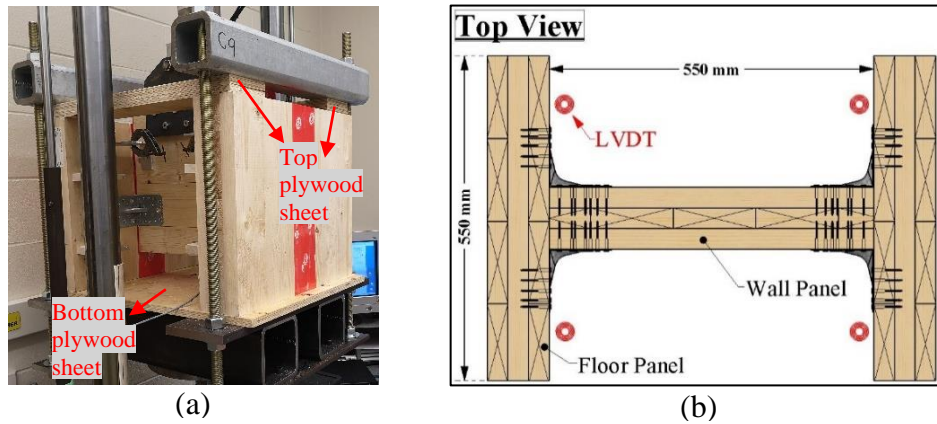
shows the test setup of cyclic uplift tests. The floor panel was held in place by two parallel rectangular hollow steel sections while the wall panel was clamped to the load cell. Due
